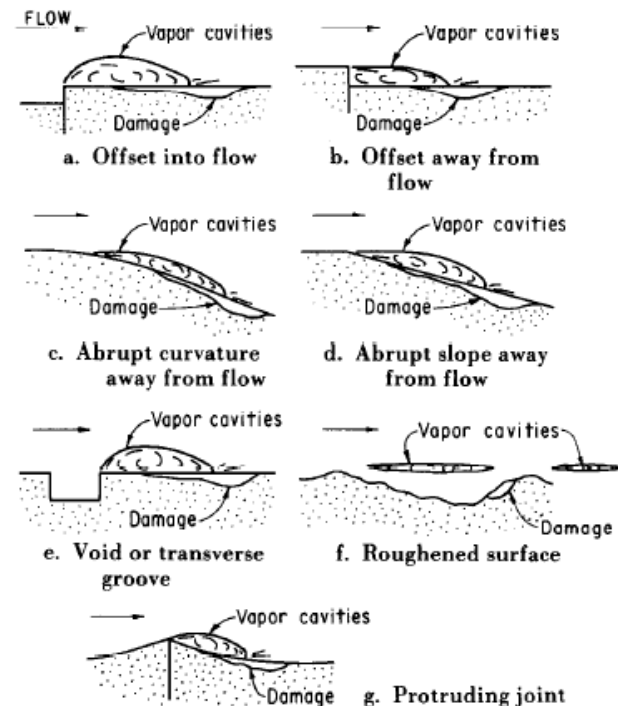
Typical isolated roughness elements found in hydraulic structures.
